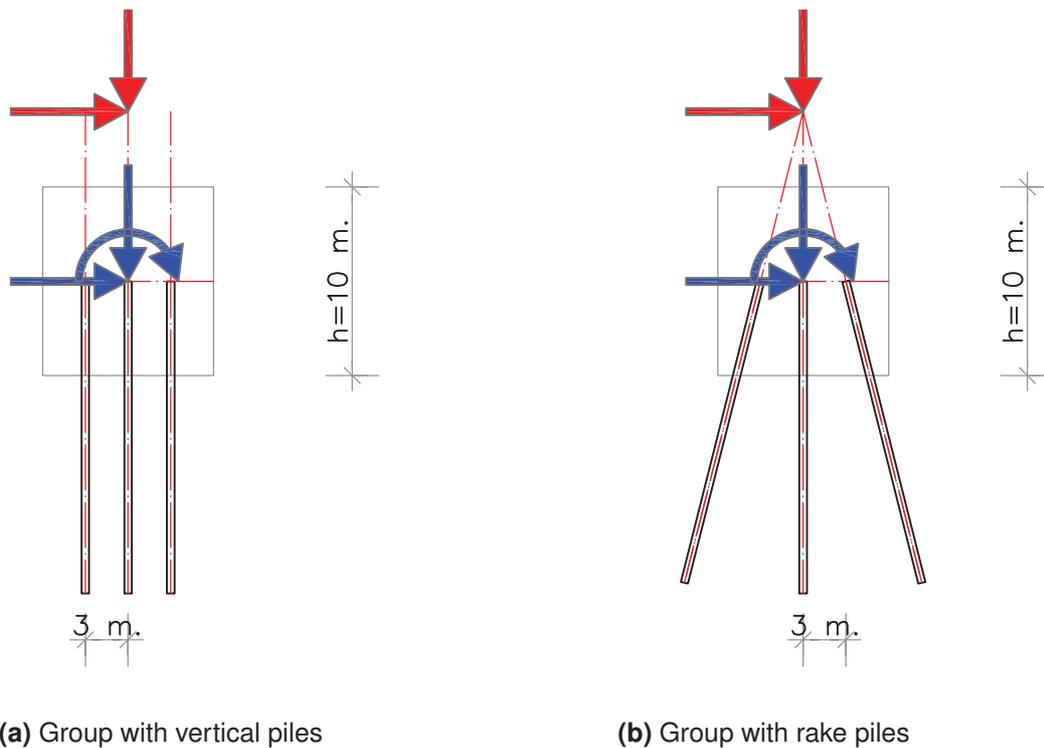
Structures with an eccentric horizontal load (red), where the resulting forces on the structure are also given (blue)
